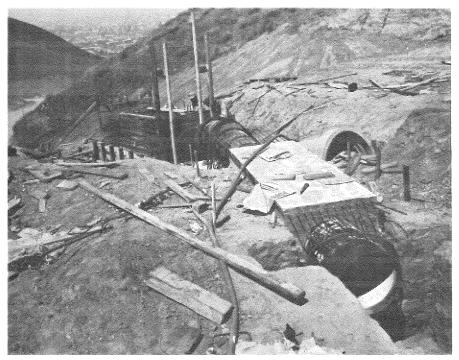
Junction of 24-inch blowoff and 42-inch spillway lines.
